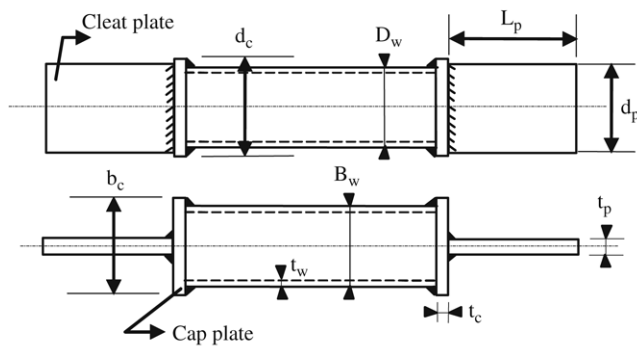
Welded T-end connection and parameters' definition.
